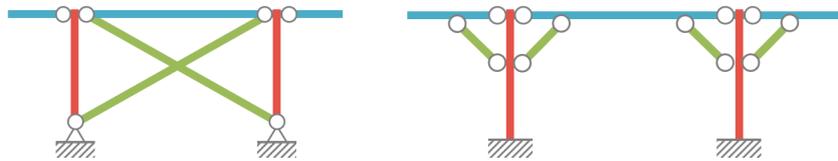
Diagonal elements (left) and knee bracings (right) to improve lateral stability of the frame
